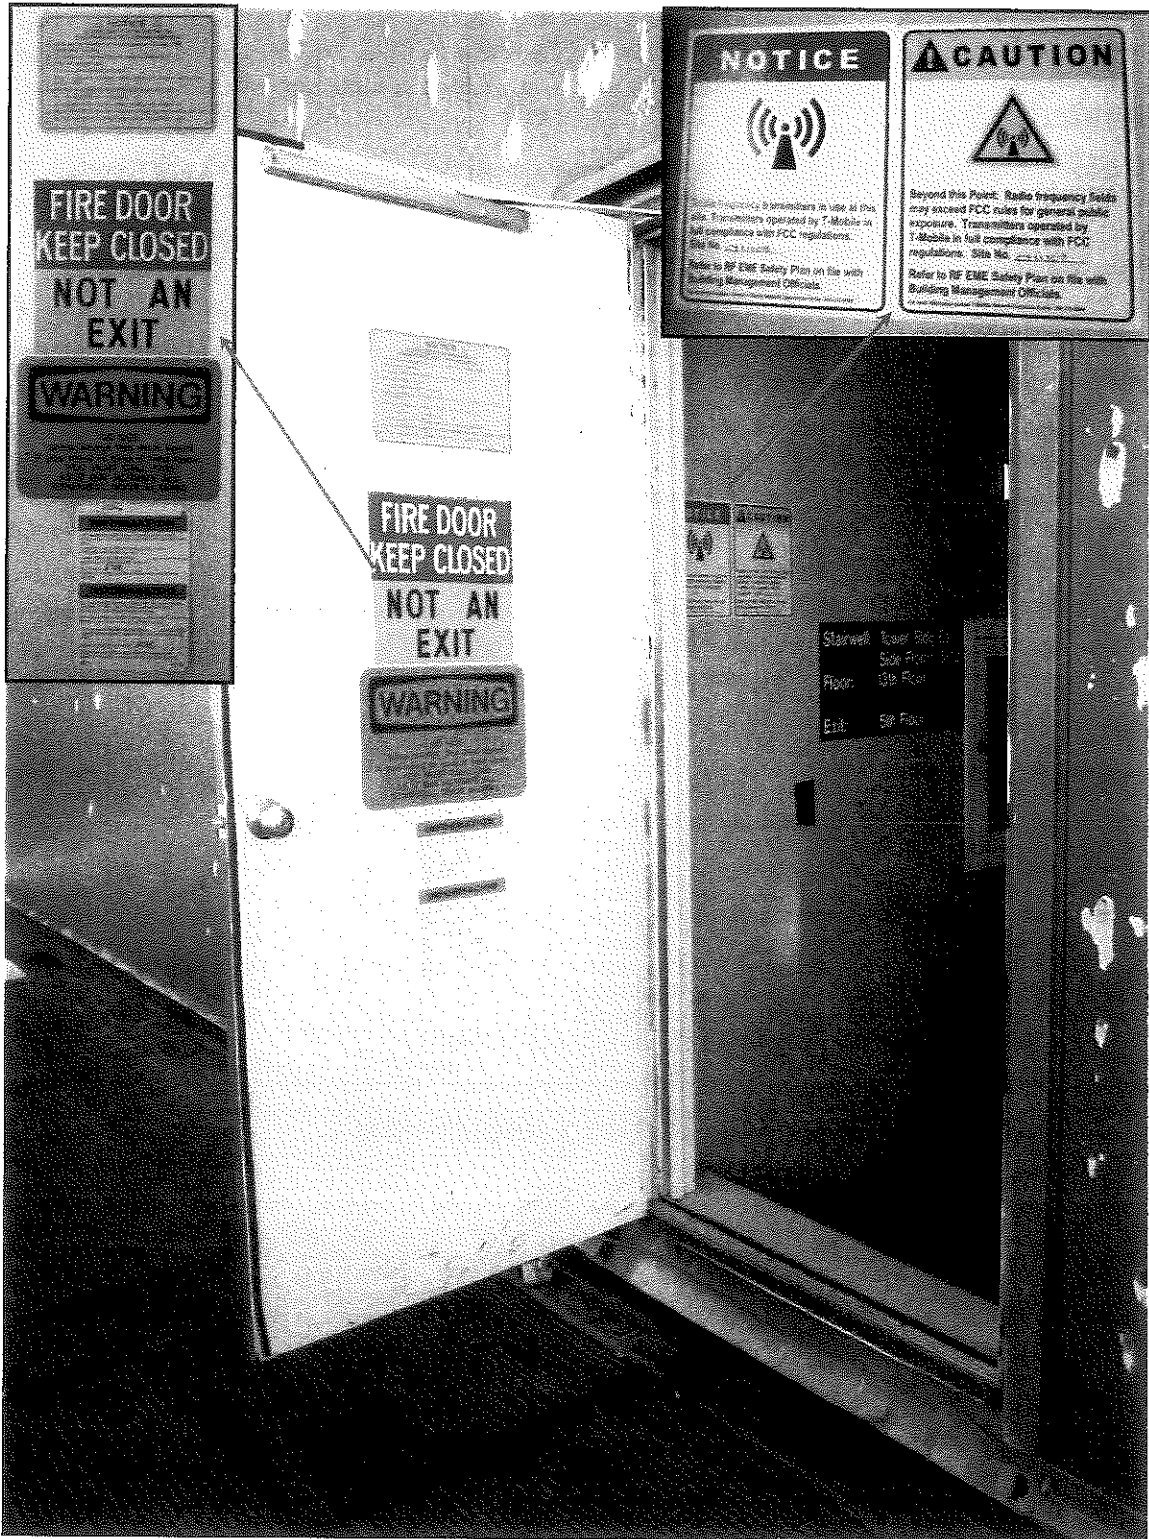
Eastern Lower Roof Access Door & Posted Signage
